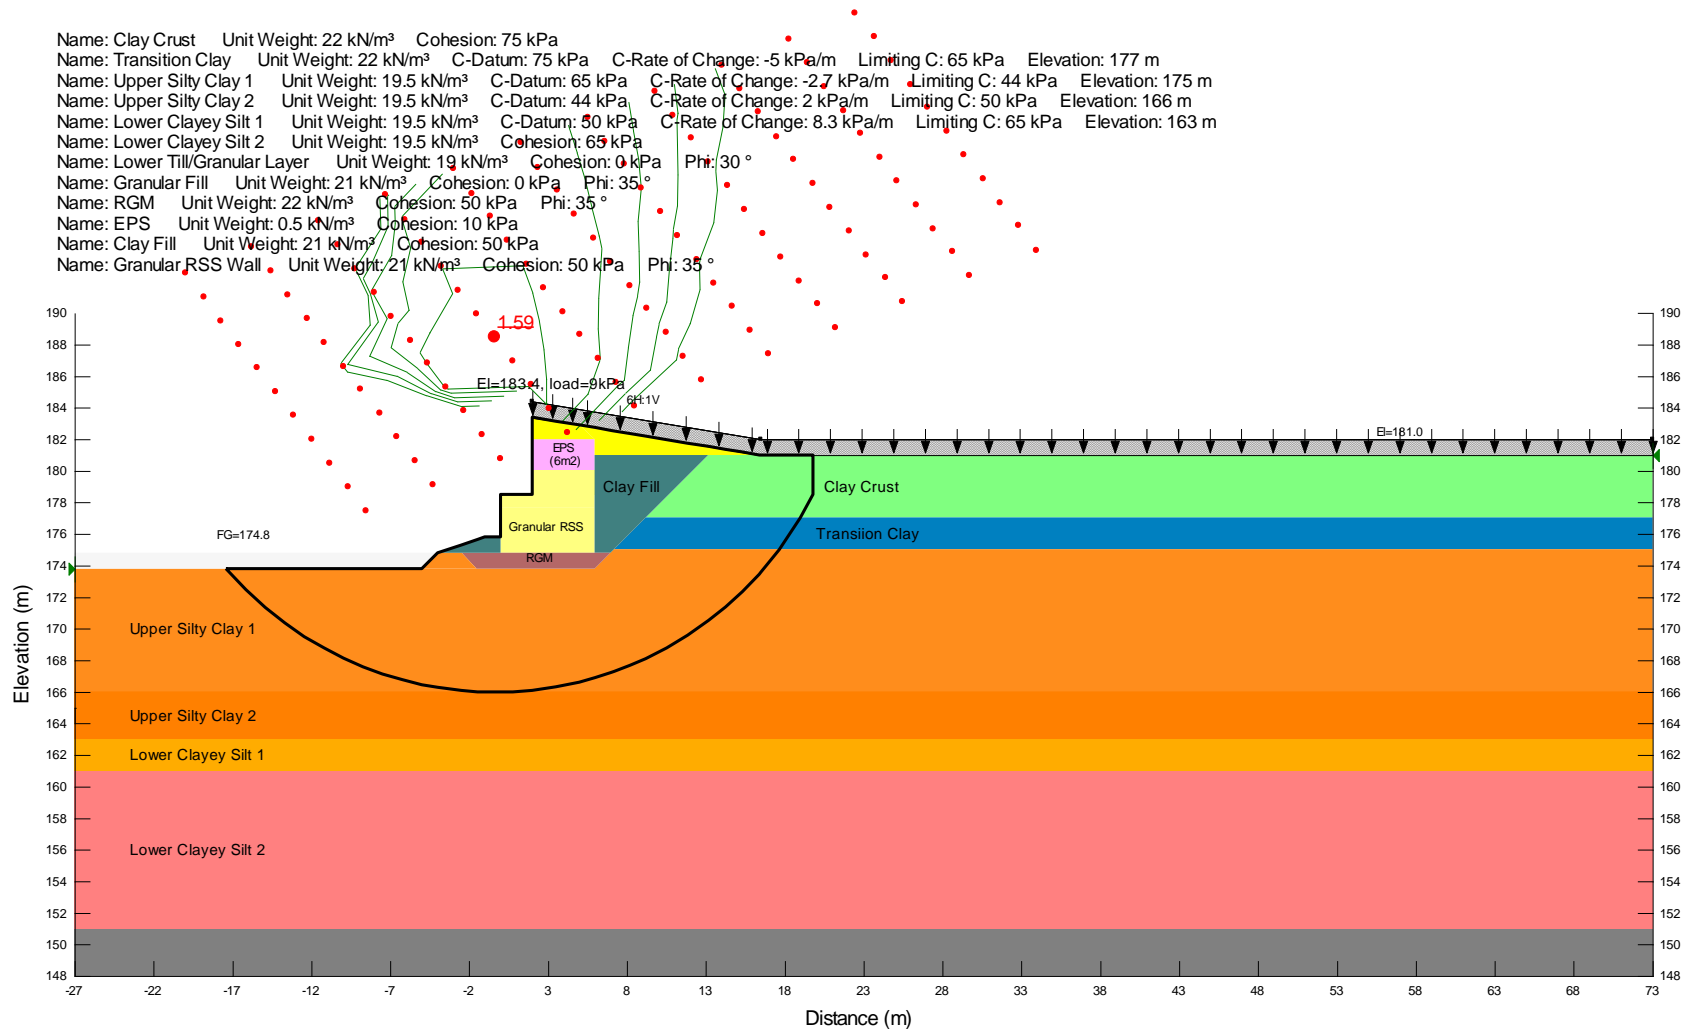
Slope Stability - Short Term - South Abutment - Station 10+450L Hwy 401
